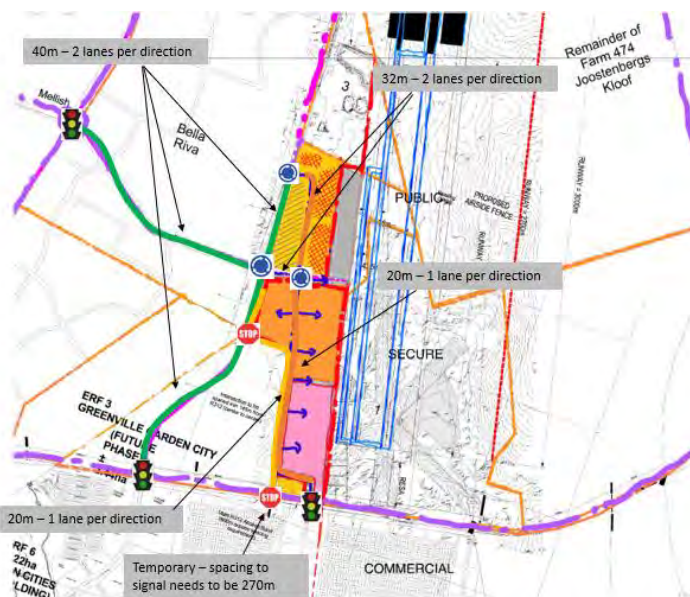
Internal Roads – Subject to further refinement of the master plan and site plan
